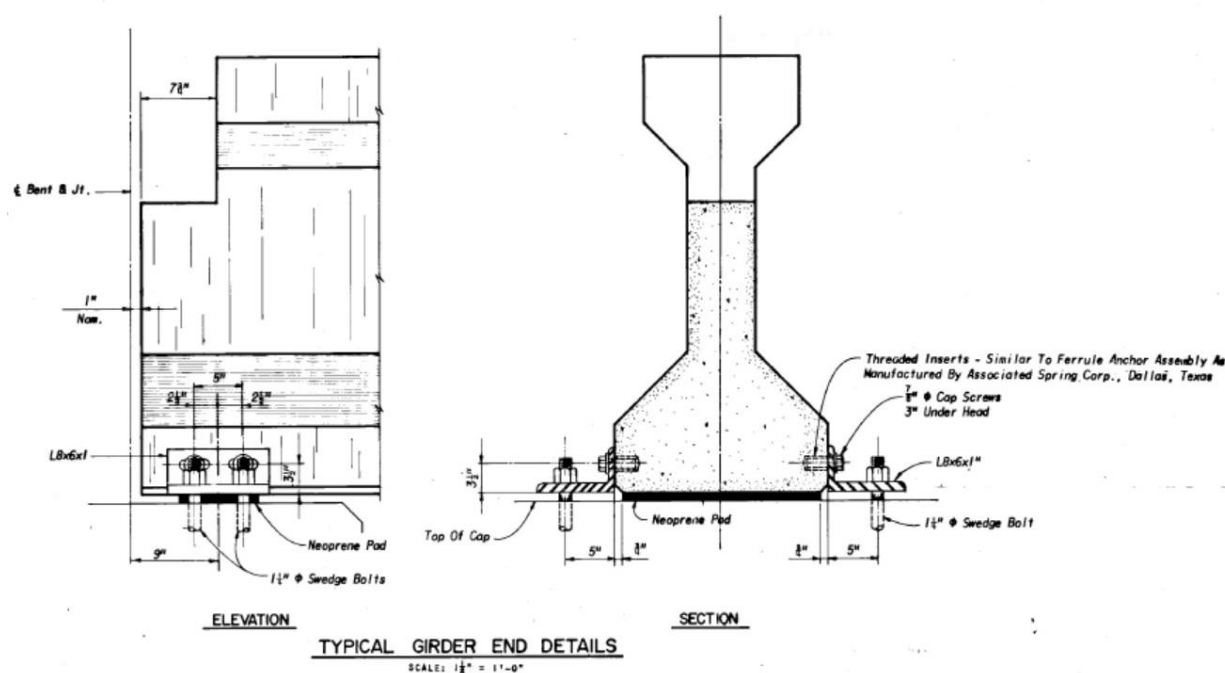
Construction plans showing the detail of the connections between the superstructure and the substructure.¹⁷
